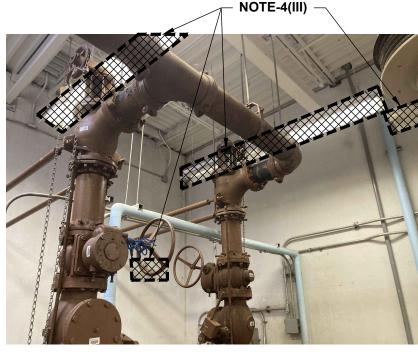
(3) - LIGHTING FIXTURE AND REMOTE HEAD PUMP ROOM
